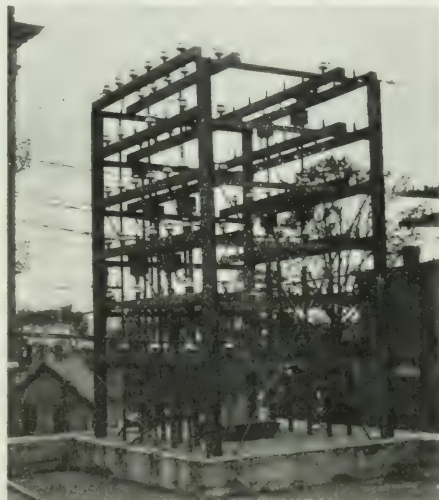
WIRE TOWER ON ROOF OF STATION.
